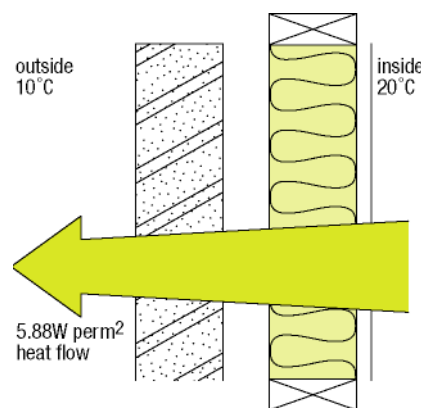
Heat transfer through R1.7 insulated brick veneer wall
